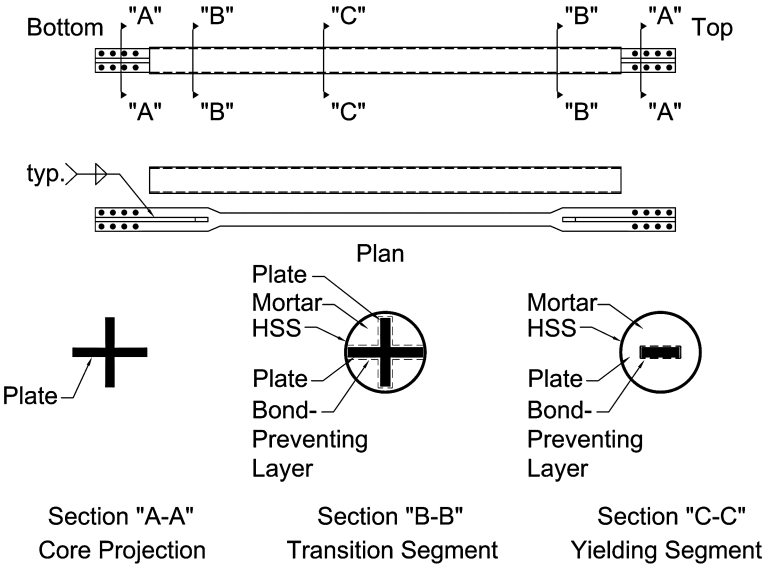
Details of a type of buckling-restrained brace (Courtesy of R. Tremblay).
